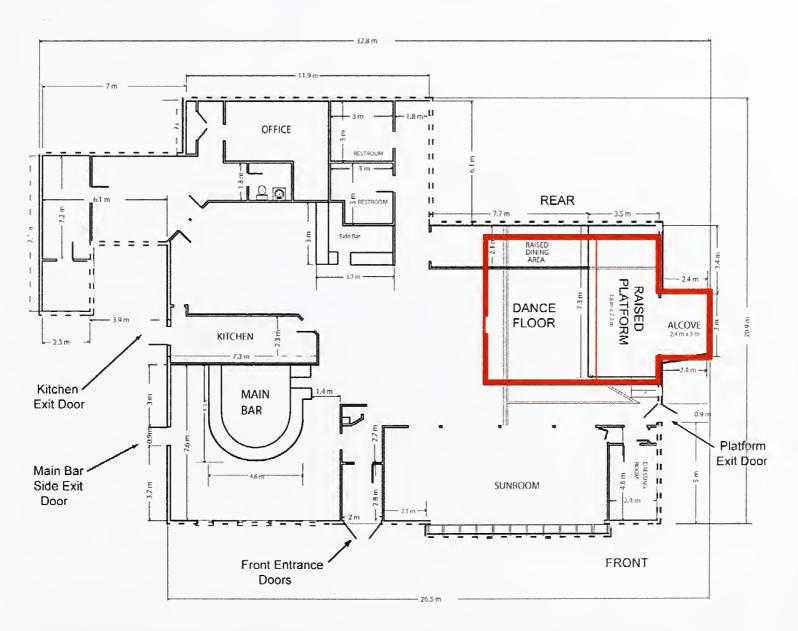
Real-Scale Mockup Floor Plan versus Station Nightclub Floor Plan.
